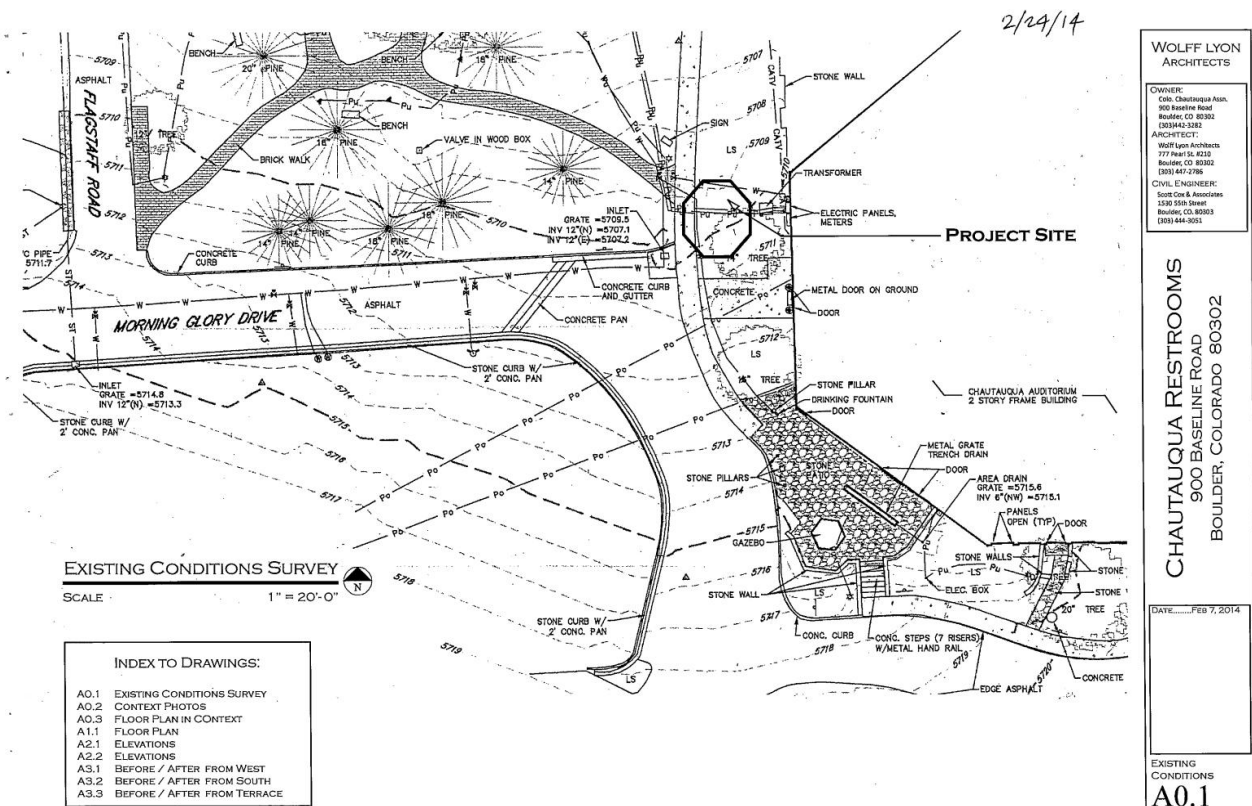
Site Plan Showing Proposed Location of the Restroom Building
